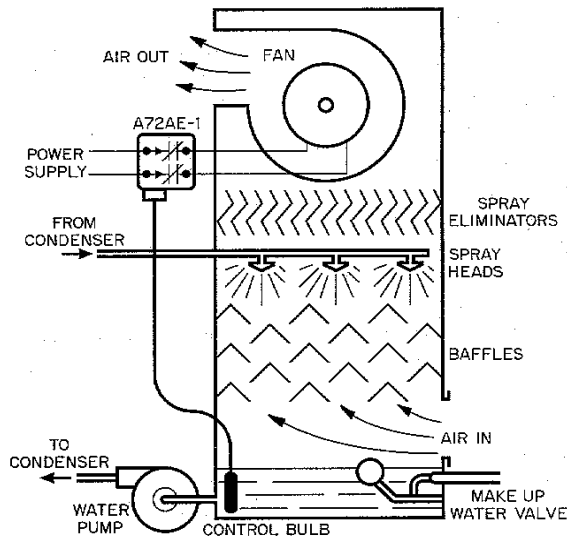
Wiring of the A72AE-1 Cooling Tower Control on a forced draft cooling tower.
